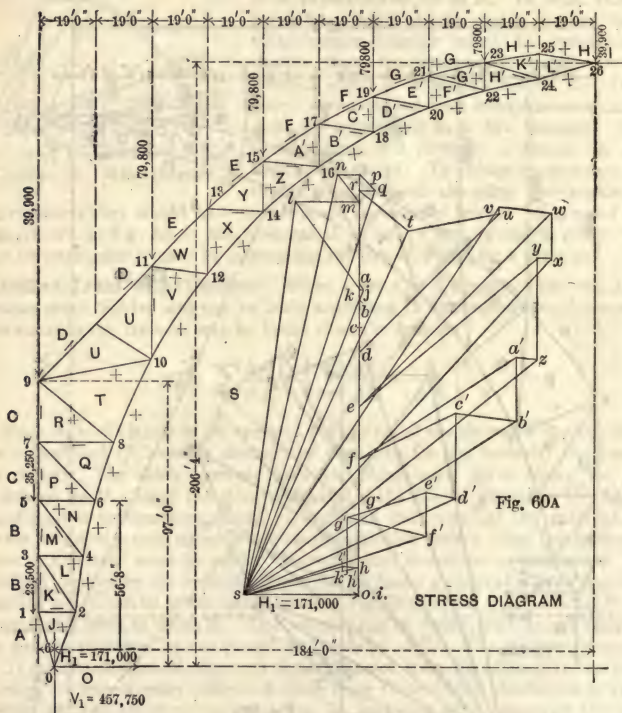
Liberal Arts Building, Chicago, Ill. Truss-diagram
